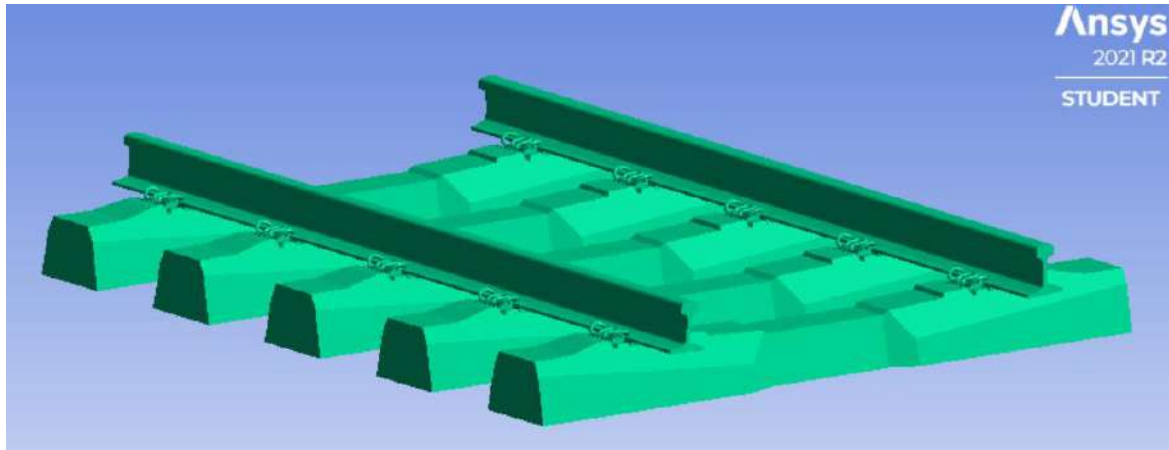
Detail of fasteners used, type Vossloh SKL [24]
